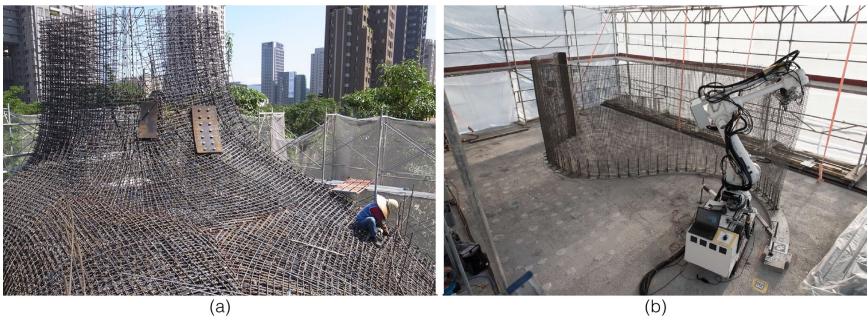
Reinforcement cages used as leaking stay-in-place formwork for concrete: (a) complex reinforcement cages of the Taichung Metropolitan Opera House, designed by Toyo Ito, Taichung, Taiwan; (b) robotic fabrication of MeshMould wall of the DFAB house at EMPA Dübendorf, Switzerland (photo credit: (a) Kai Nakamura; (b) EMPA).
